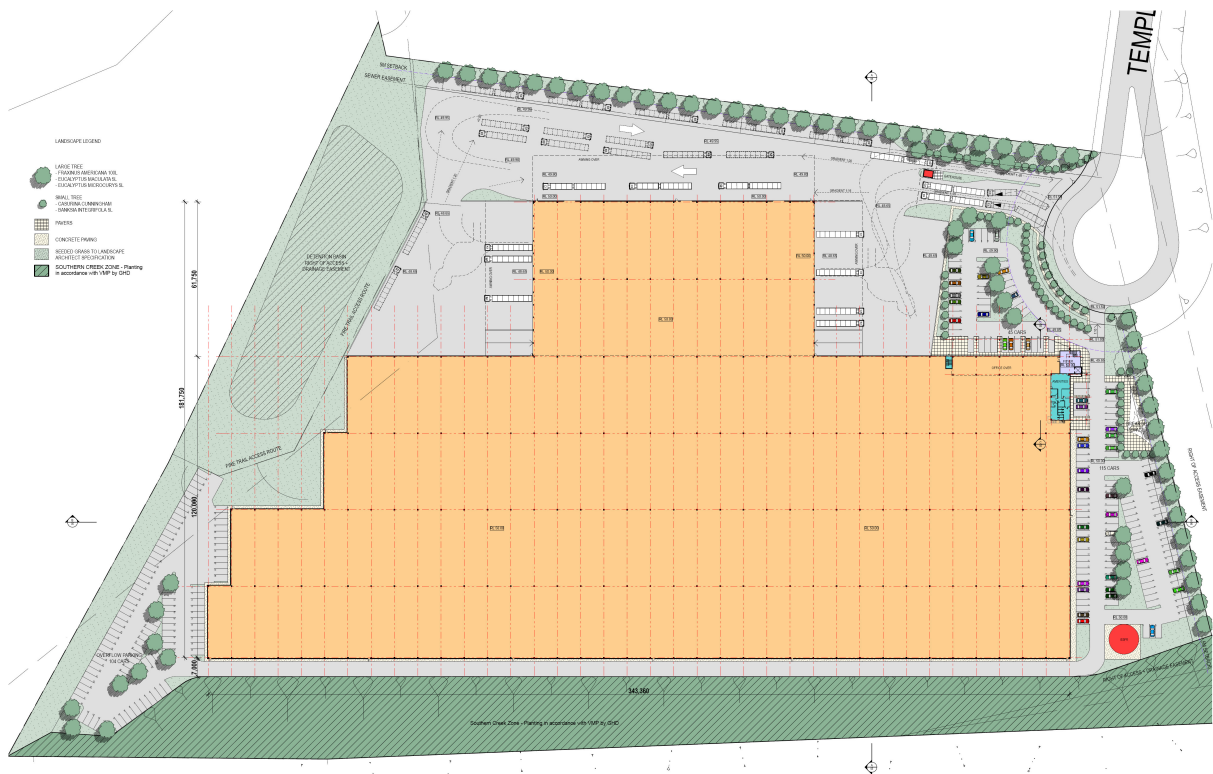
Layout of the Proposed Facility for Site Area H (Stage 1)
